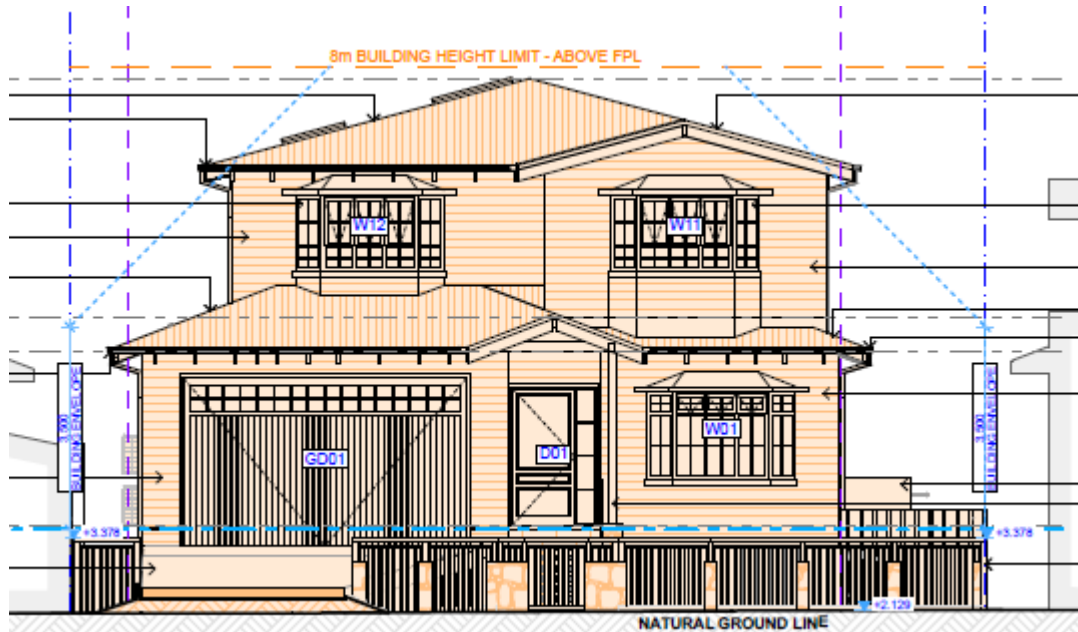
Plan Extract: West elevation illustrating the proposed building envelope.
